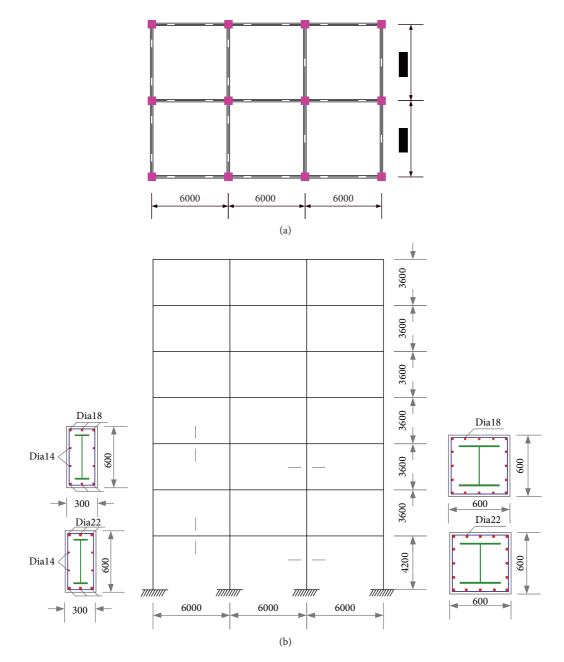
Structure diagram: (a) plan; (b) elevation.
